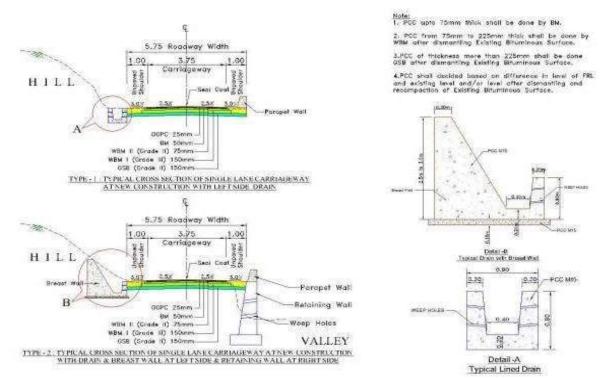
Typical Cross-Section of Single Lane carriageway with Drain and Breast Wall at Left side and Retaining wall at Right side.
